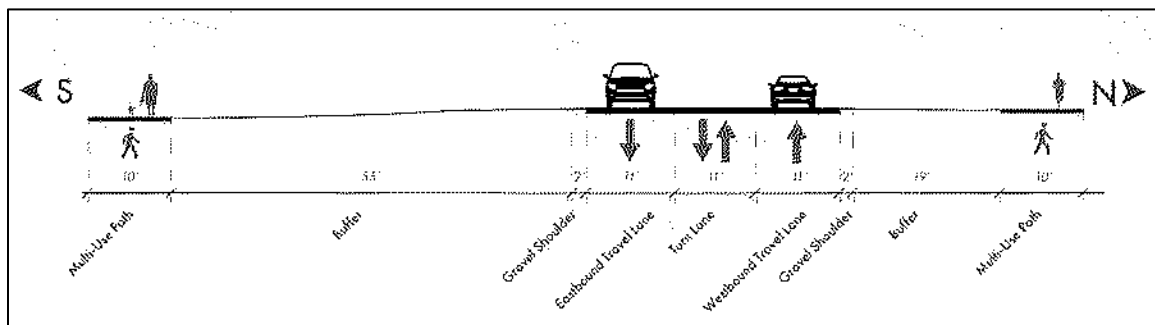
TYPICAL SECTION, HIGH SCHOOL ROAD BETWEEN MIDDLE SCHOOL ROAD & GREGORY LANE
